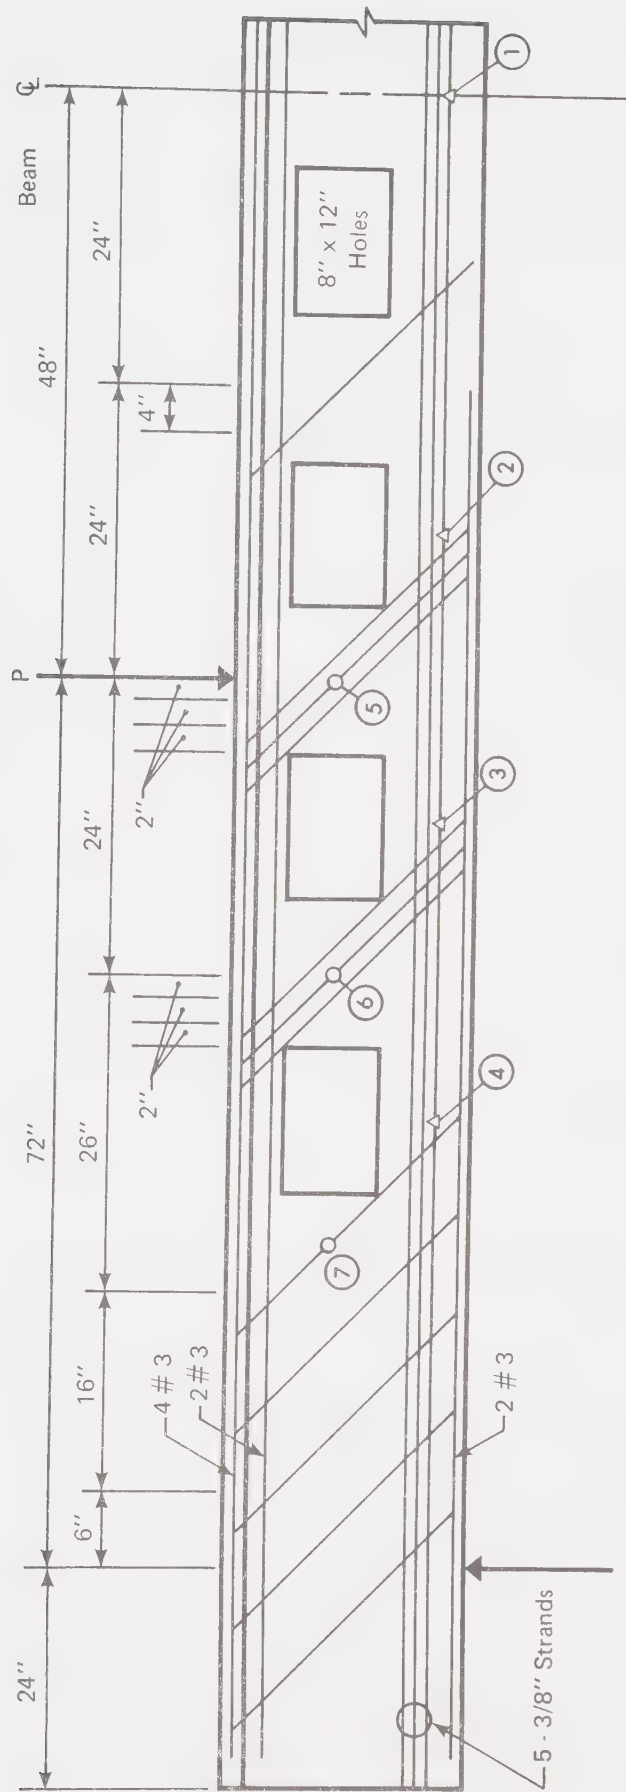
Reinforcement Details and Strain Gage Locations for Beam 14-12-6
